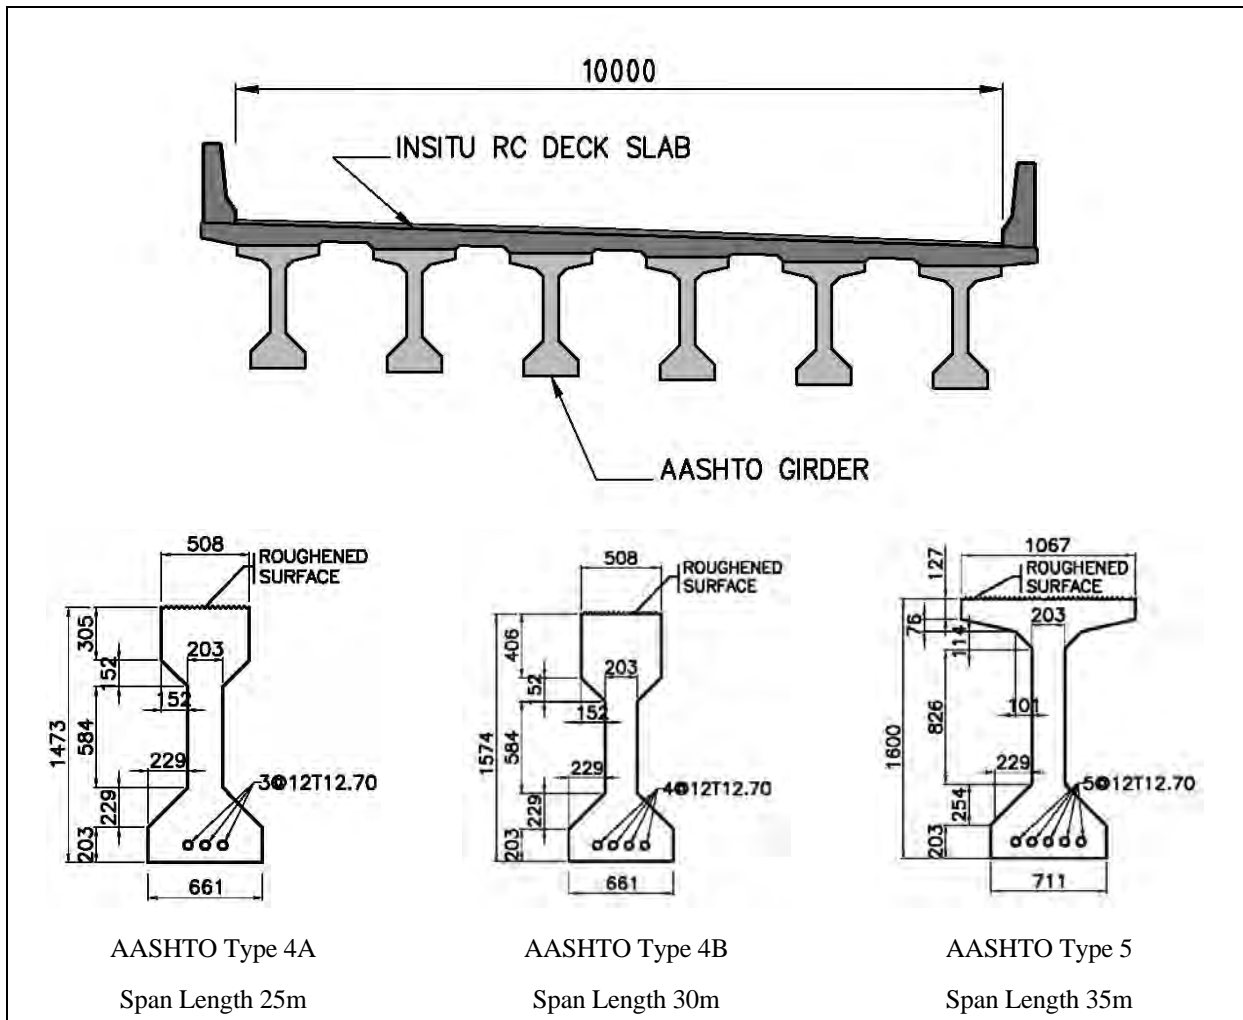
Typical AASHTO Girder Deck and Sections
